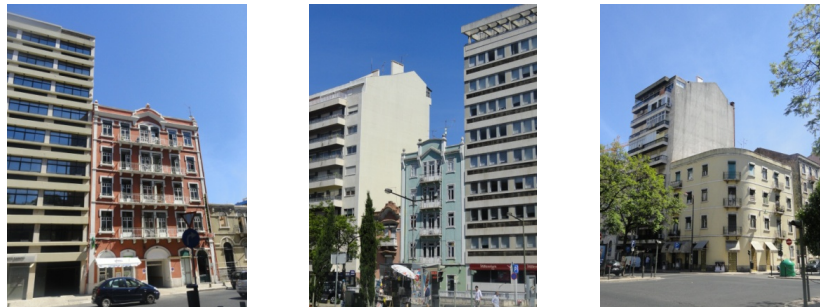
New reinforced concrete buildings within the old masonry compounds of buildings.
